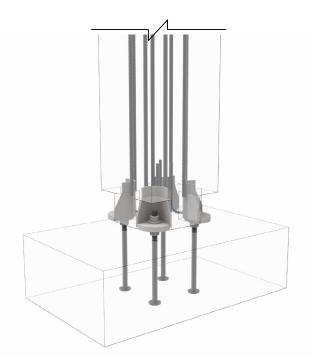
Bolted column – foundation connection with 4 × NKP/L anchor bolts and 4 × NKK column shoes
